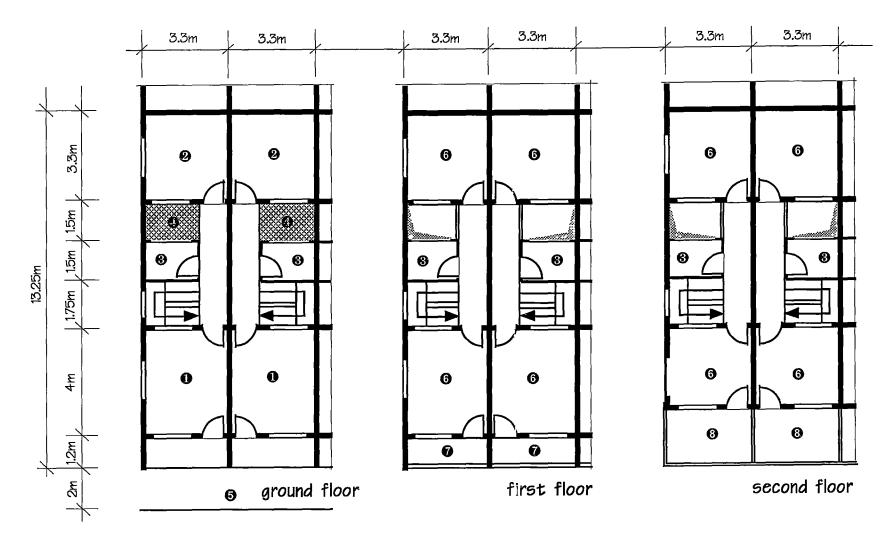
Example plan of two houses for rebuilding in Truong Dinh
